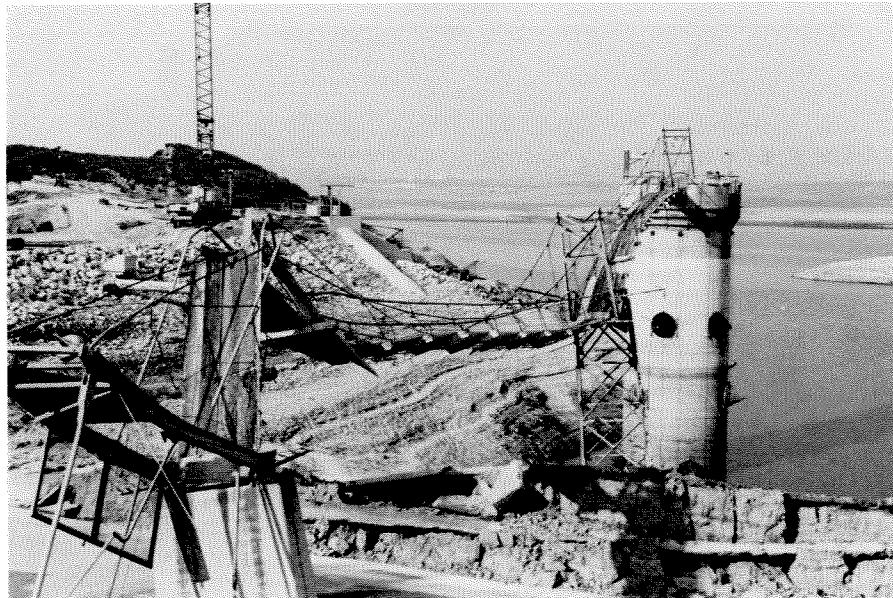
Damaged elevated walkway at the lower Van Norman Reservoir.
